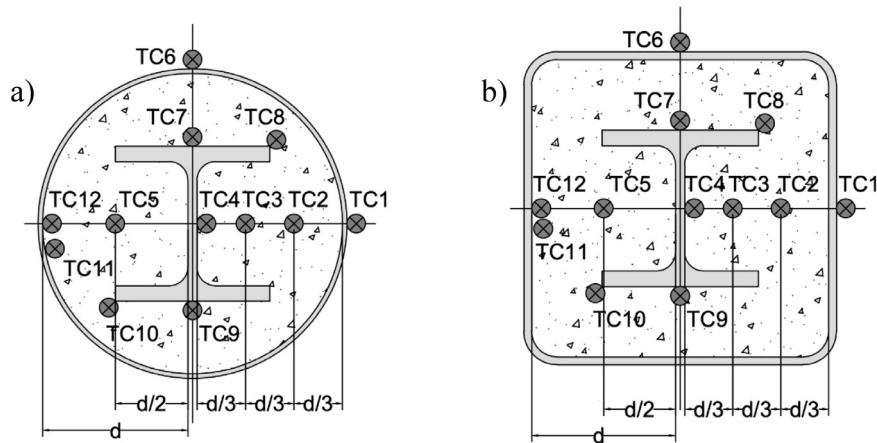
Thermocouples layout: (a) circular sections; (b) square sections.
